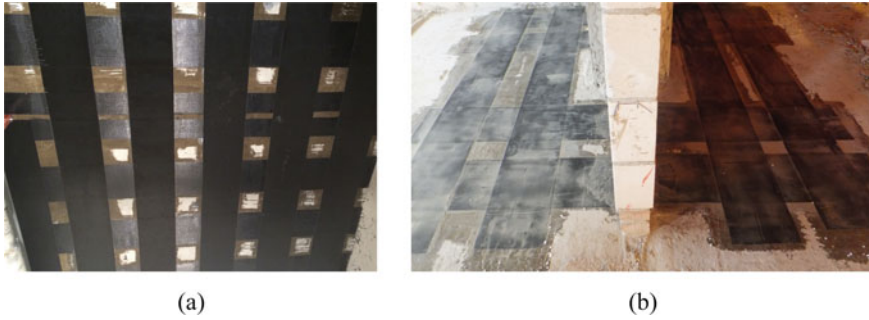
Reinforcement of girderless ceilings a span zone; b support zone
